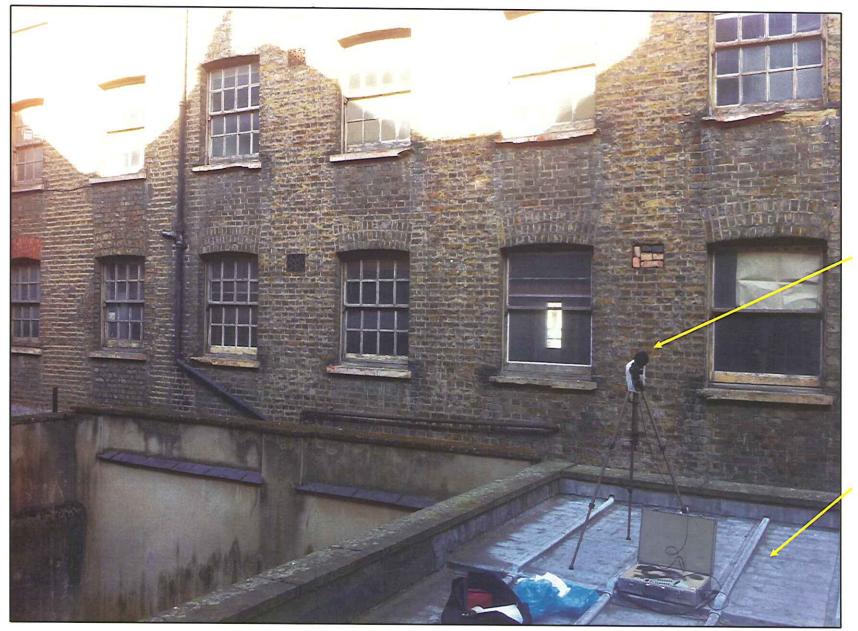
PHOTO A: First floor roof to rear of building with disused building to rear of site.
